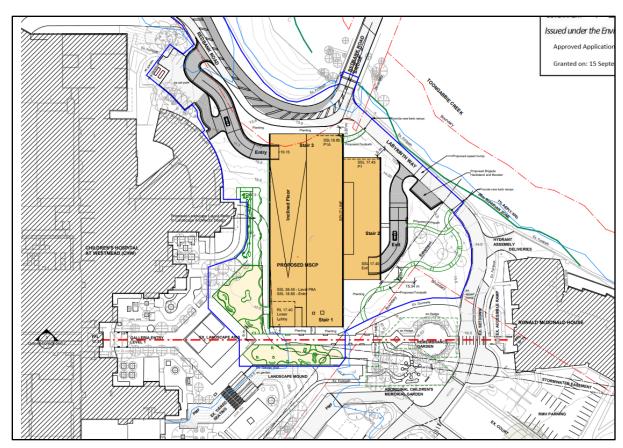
| The Children's Hospital at Westmead multi-storey carpark layout (Source: SSD-10434896 Approved Plans)
